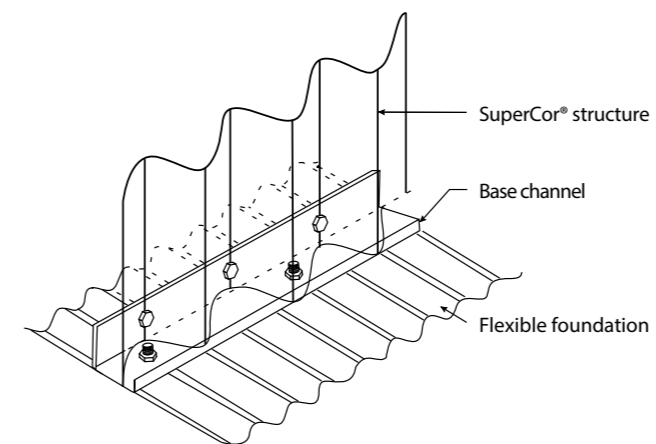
Connection of SuperCor® structure with steel footer pads of a full steel invert
